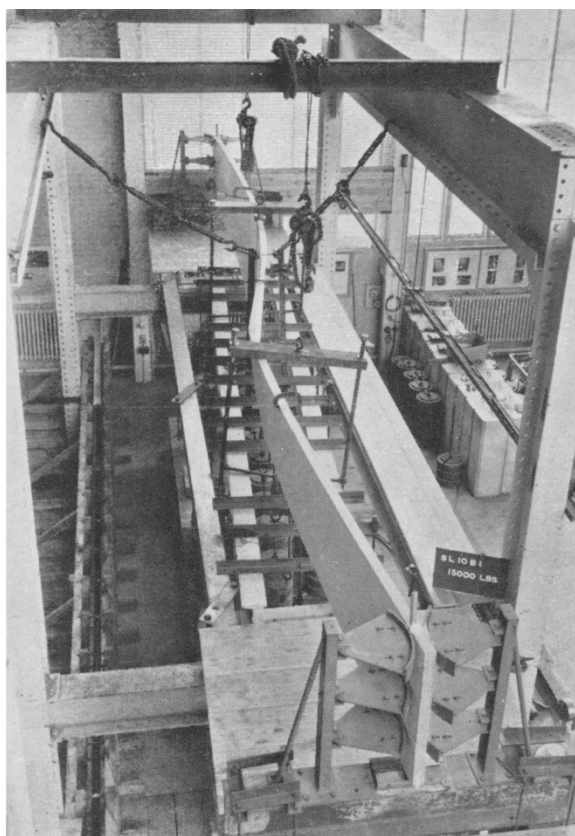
Testing slender reinforced concrete beam. Photo: Public domain [15]
